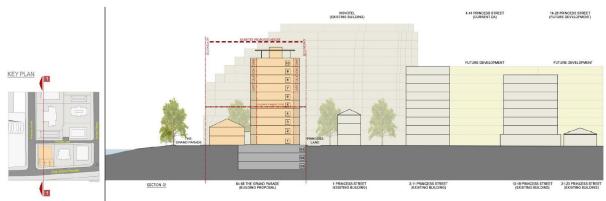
Contextual cross section East-West (Source: Urban Design Report)
